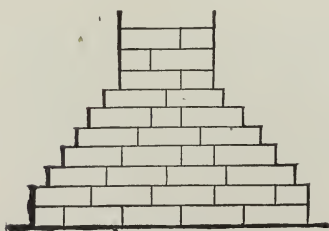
Wide Brick Footings for Heavy Walls on Compressible Soils.
